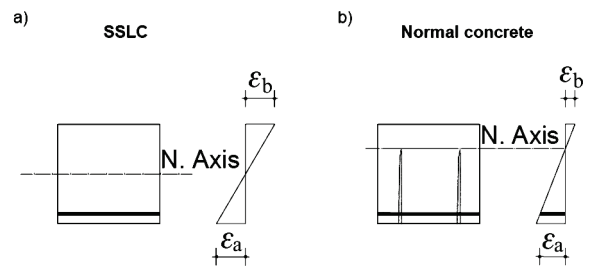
Schematic representation of strain distribution in concrete and reinforcement in models with a) SSLC and in b) conventional concrete
